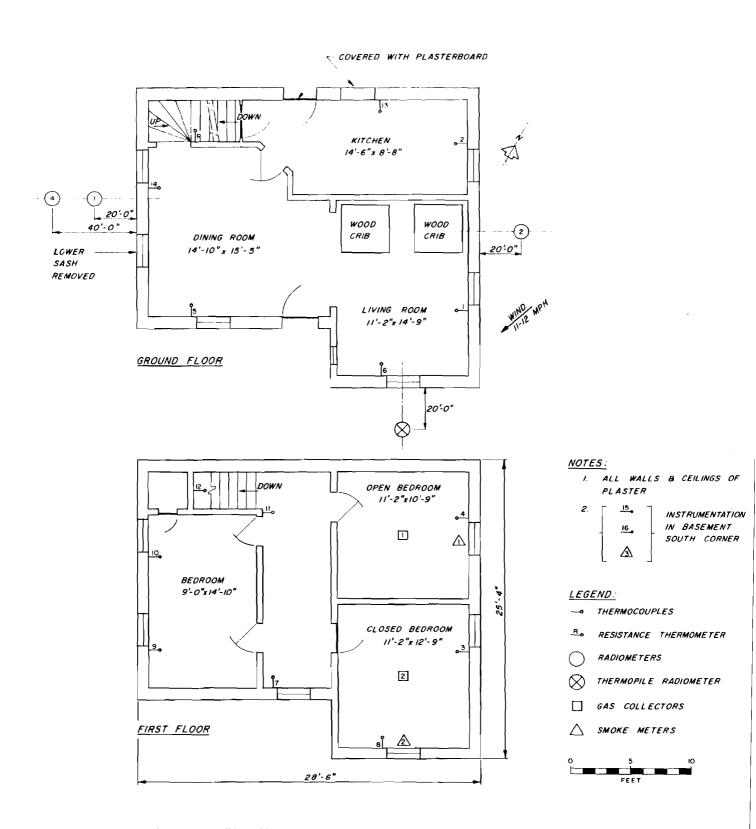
BUILDING No. 4 - TWO - STOREY WOOD FRAME DWELLING WITH
